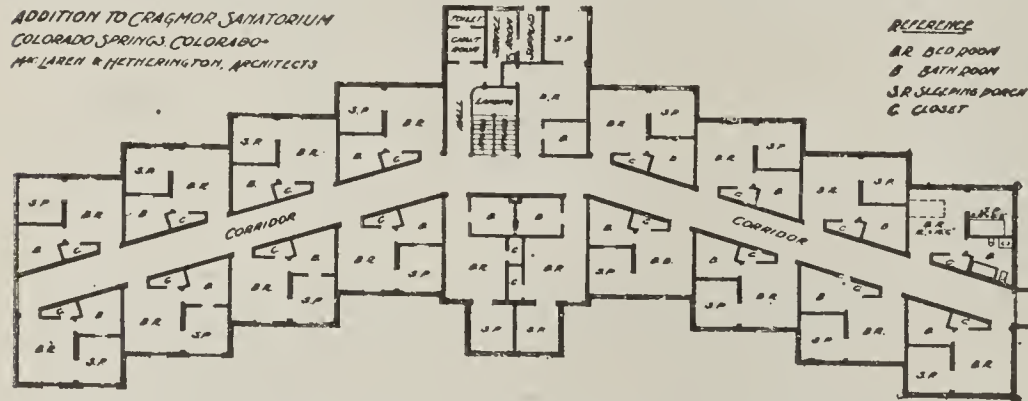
This addition will be connected with the existing building by a corridor so as to utilize the kitchen service. The jog in the wall gives each inside room two outside fronts and secures privacy for the sleeping porch. Each unit opens directly on the corridor.
